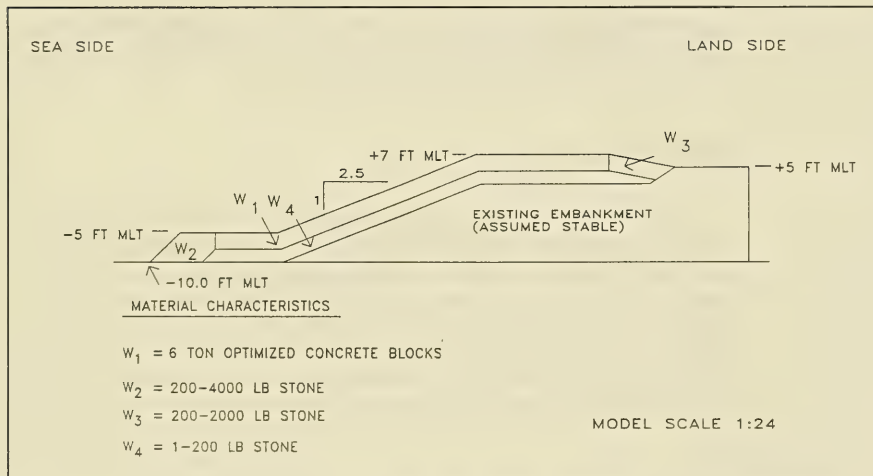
Optimized concrete block revetment cross section, Plans 9 and 9R
